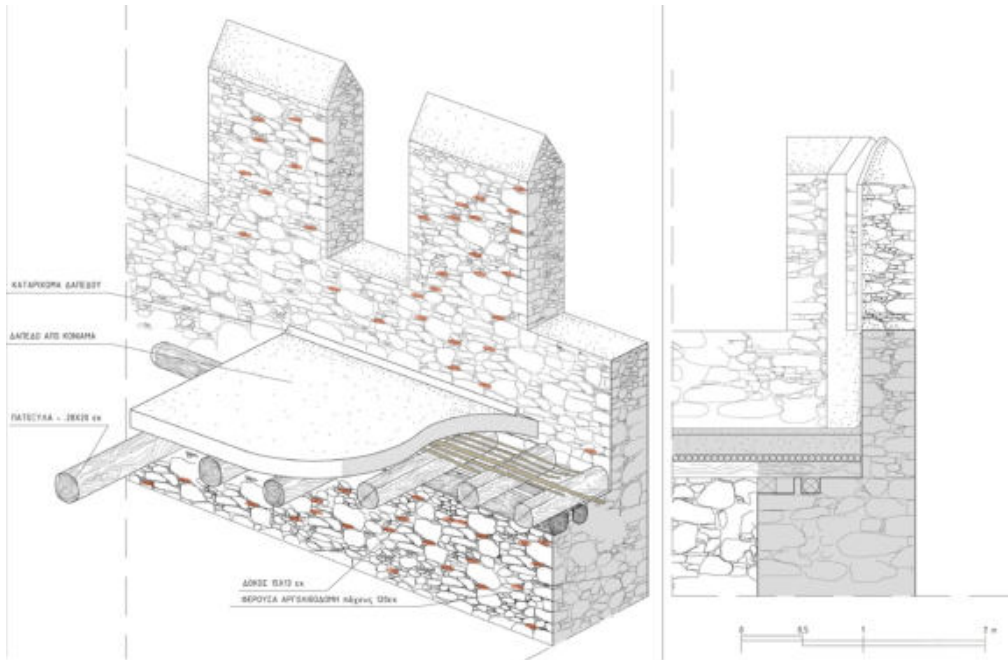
Detail drawing of the horizontal dome structure of Building A (graphic reconstruction) (Michael Miaoulis, 2018)
